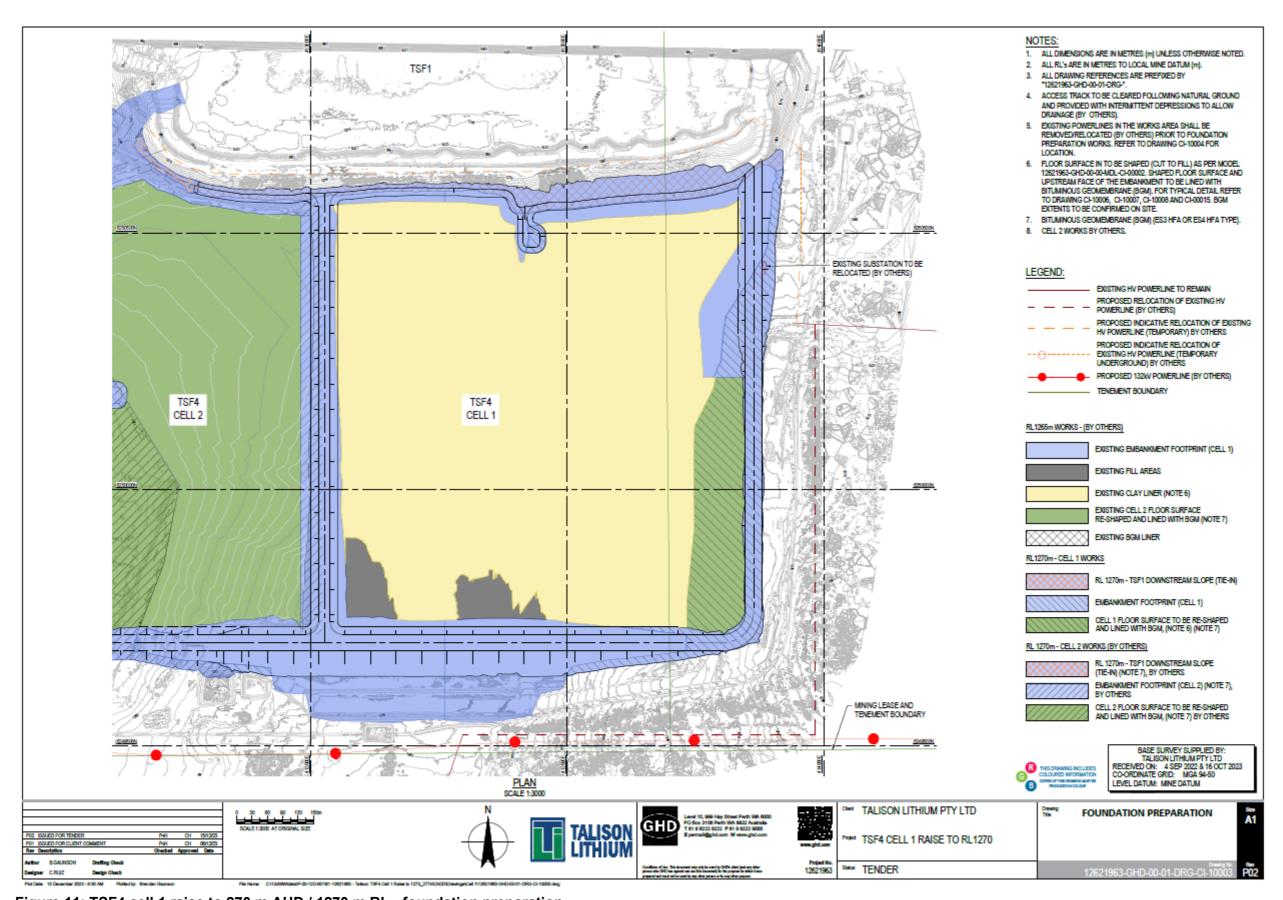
TSF4 cell 1 raise to 270 m AHD / 1270 m RL - foundation preparation
